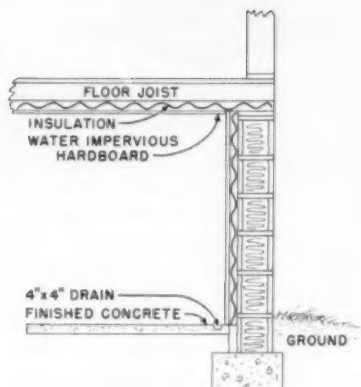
Apply nailing strips to masonry or rough-surfaced walls before insulating. These strips support the insulation and provide a nailing surface for the wall board.
